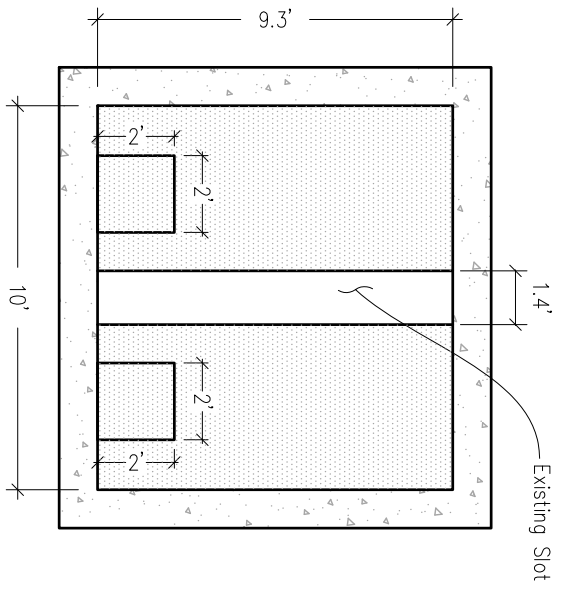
Plan view of the existing concrete fishway at Steamboat Falls.
